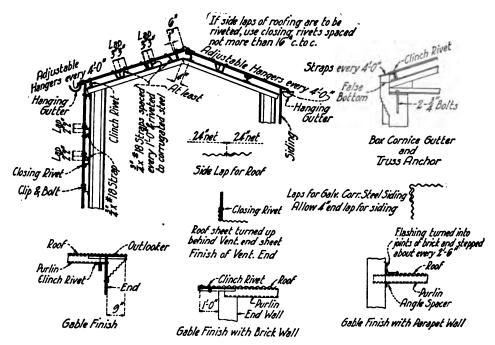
DETAILS FOR CORRUGATED STEEL.
